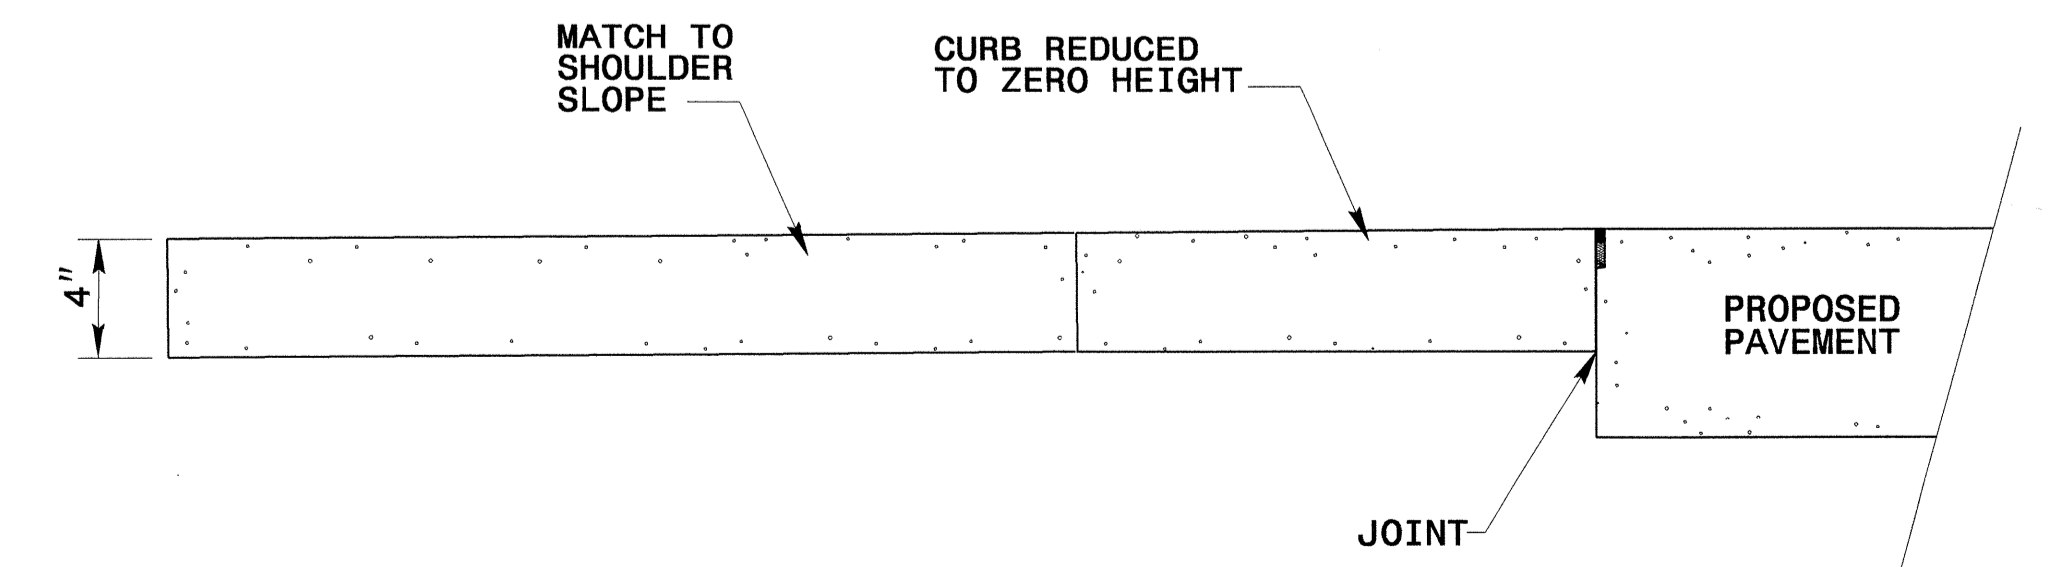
DETAIL OF PROPOSED CONCRETE BRIDGE SIDEWALK APPROACH
